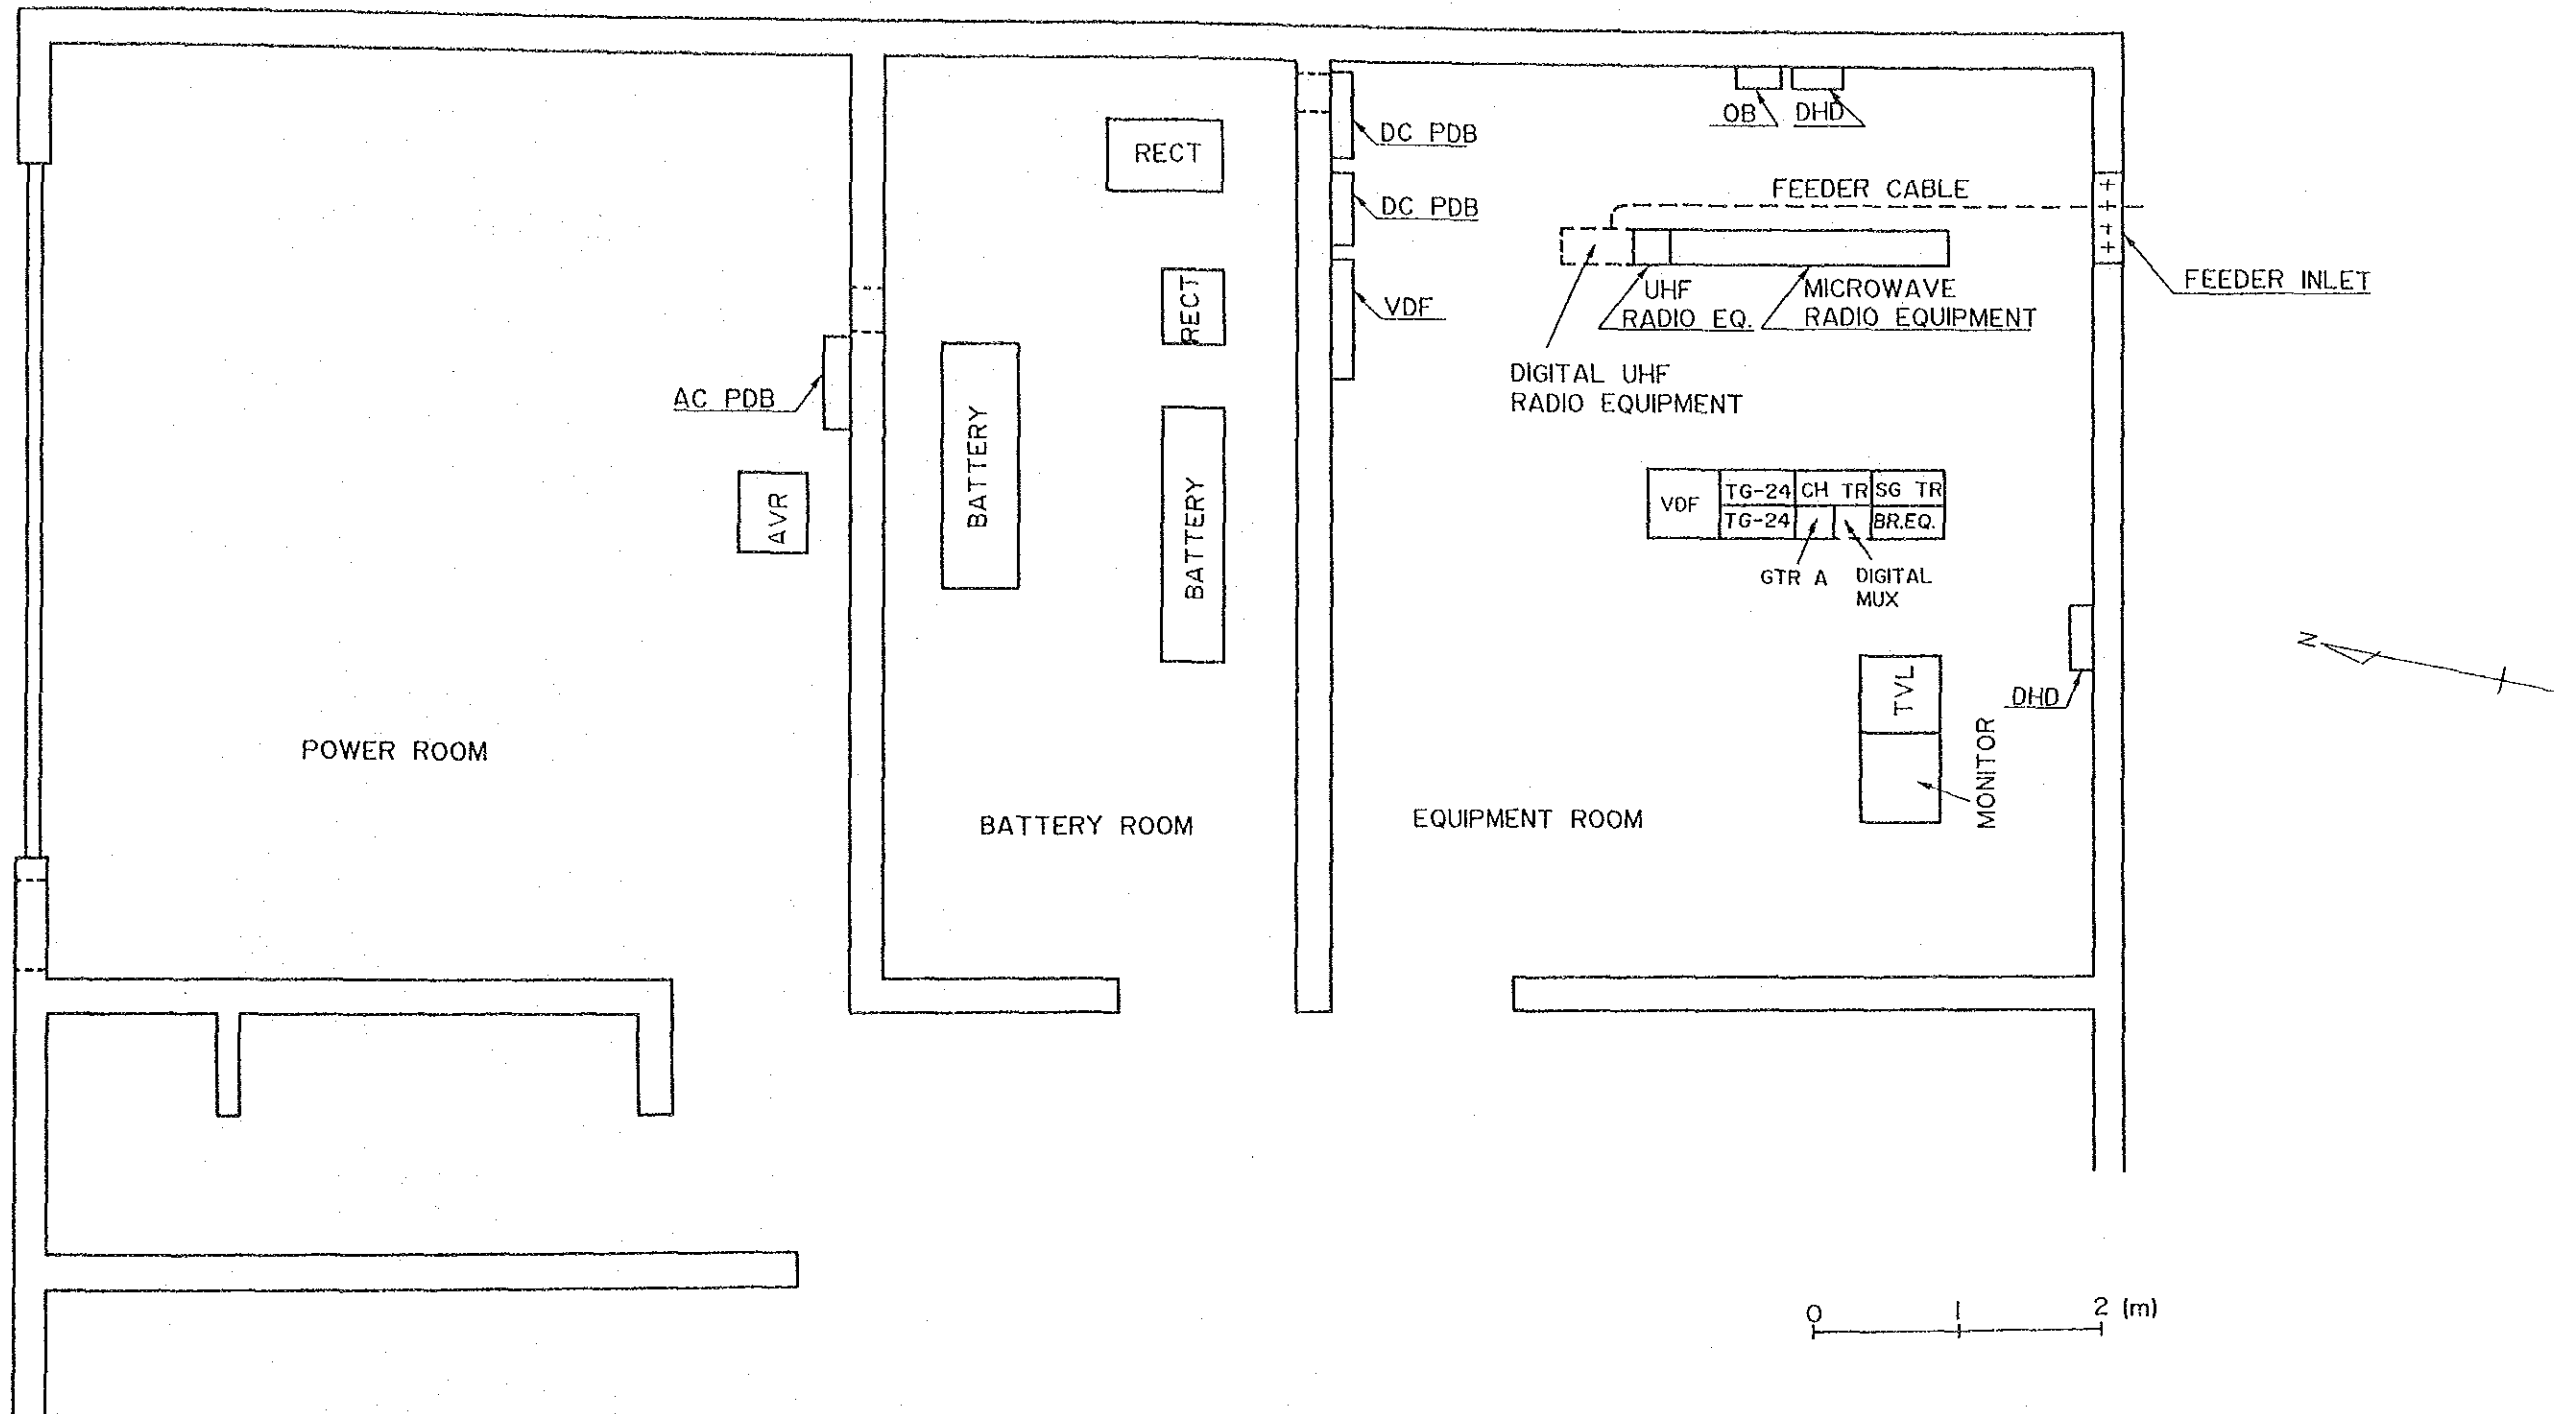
Floor Layout at Magwe Microwave Station
